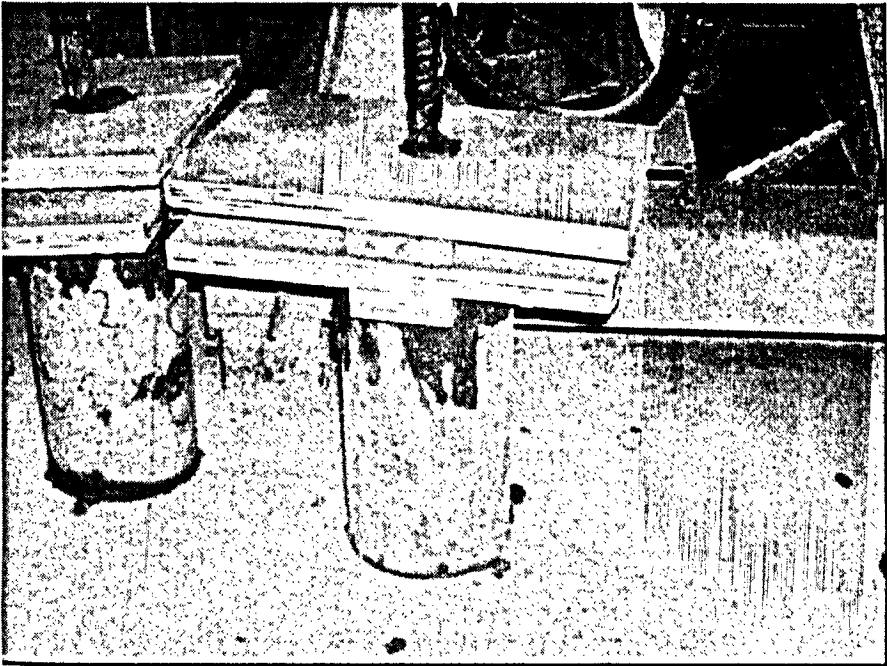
Mechanisms of centering the steel bar in pullout specimens
